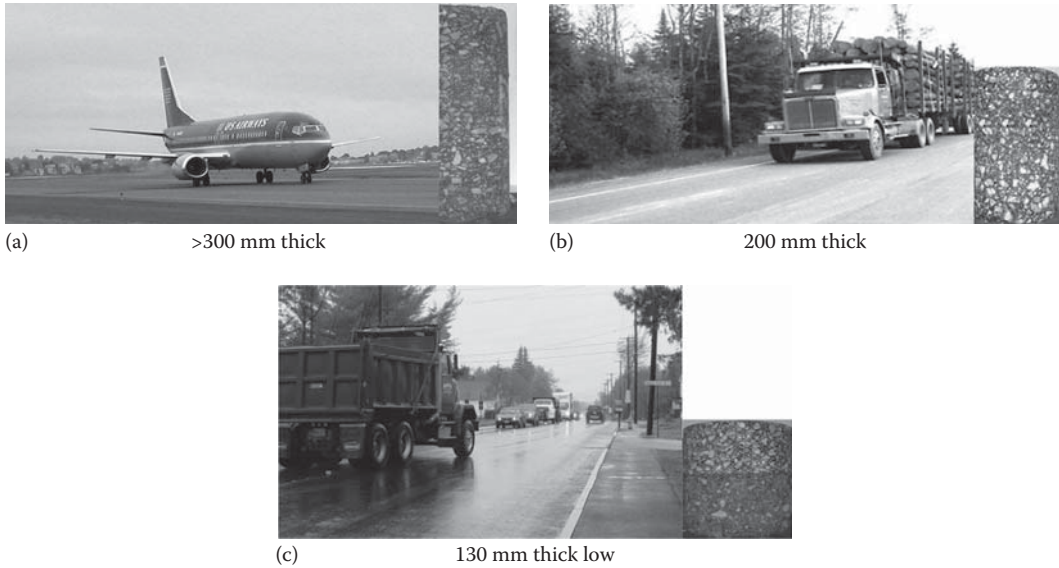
Thicker pavements are provided for heavier loads. (a) Airport pavement, (b) highway pavement, and (c) low traffic volume pavement.
